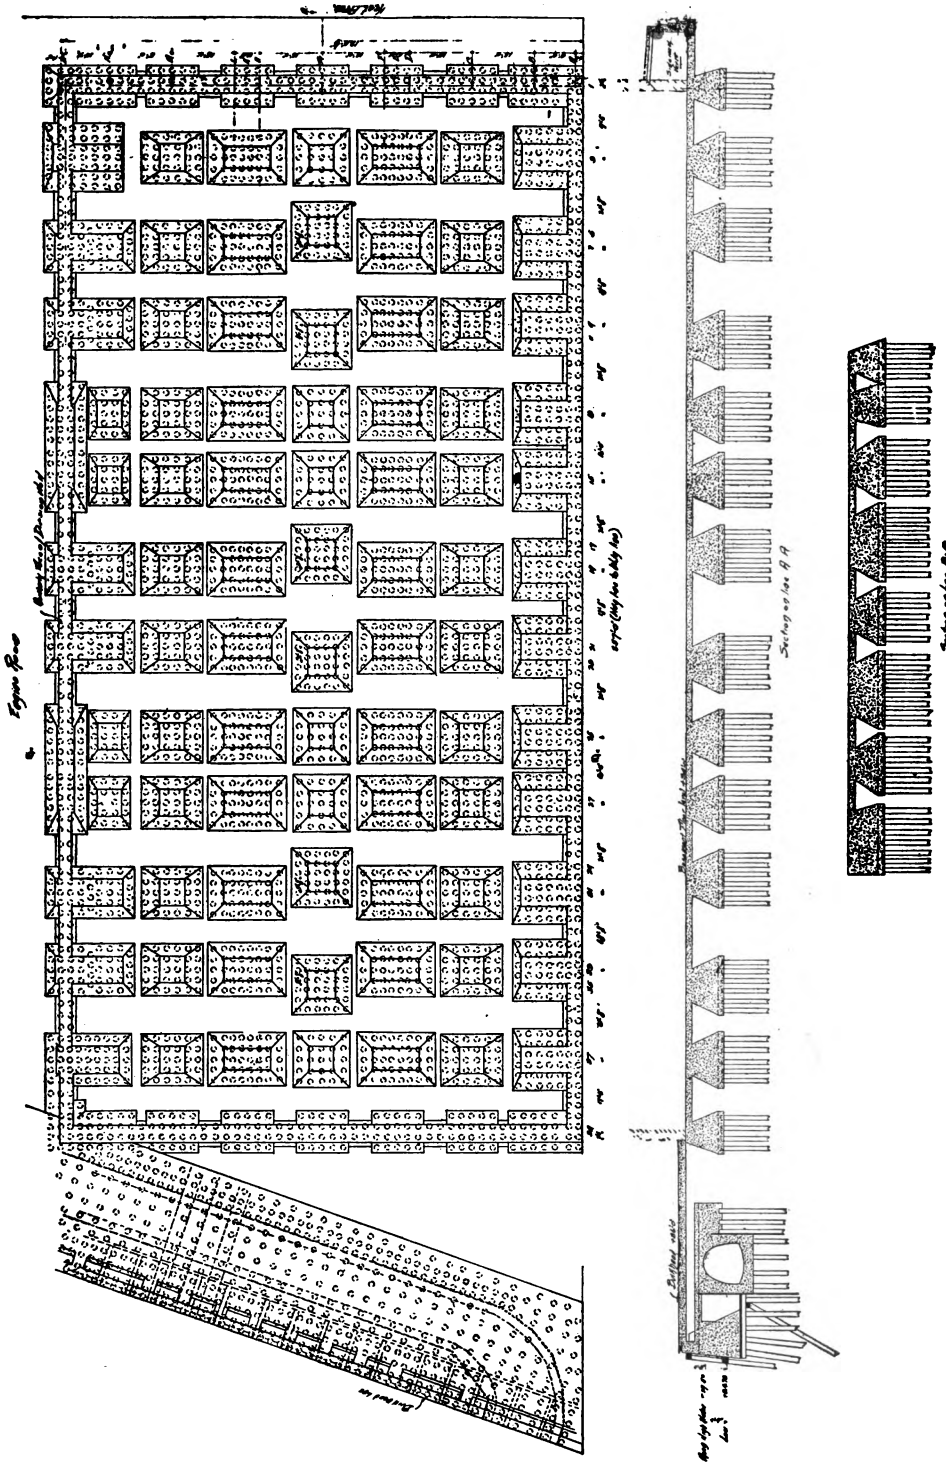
Piling and Foundation Plan, Williamsburg Station.
